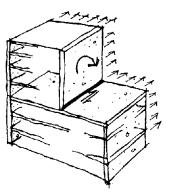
Setbacks which contain shear walls may create severe problems in transferring forces to the foundation.
